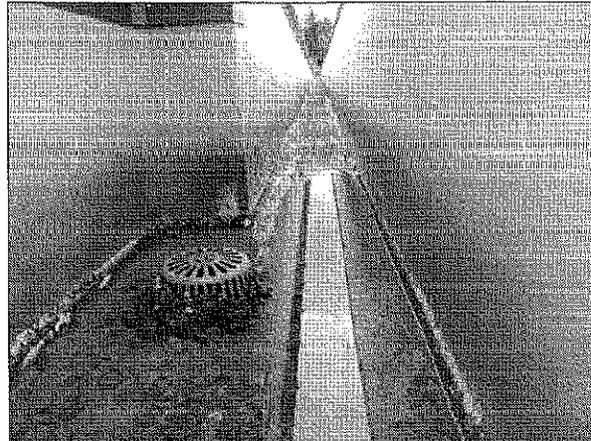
Clogged roof drain and ponding at base of Beach natatorium roof section
